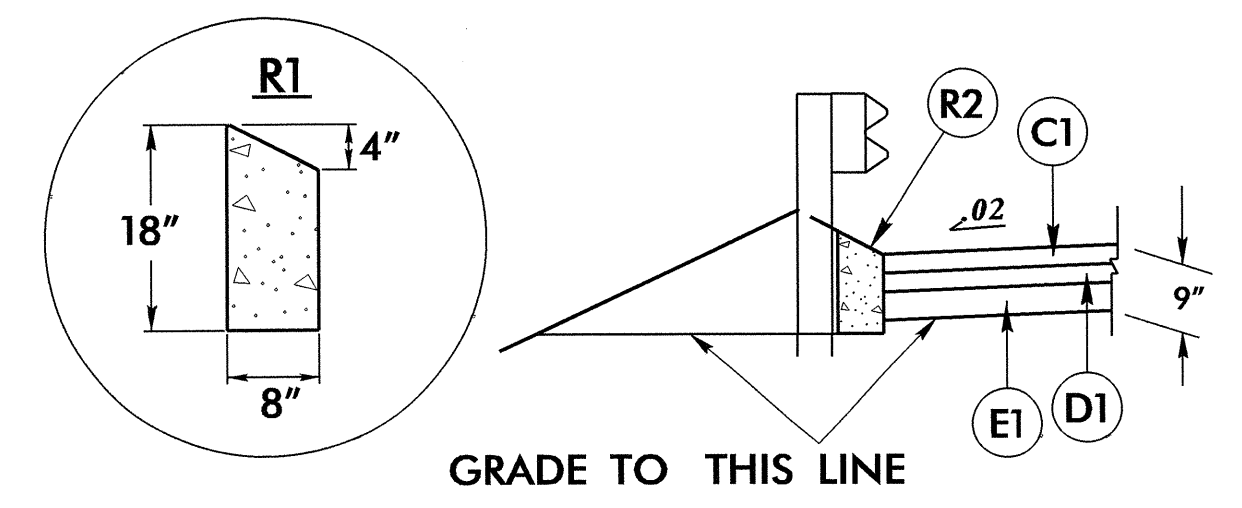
DETAIL SHOWING METHOD OF WEDGING ON BRIDGE
